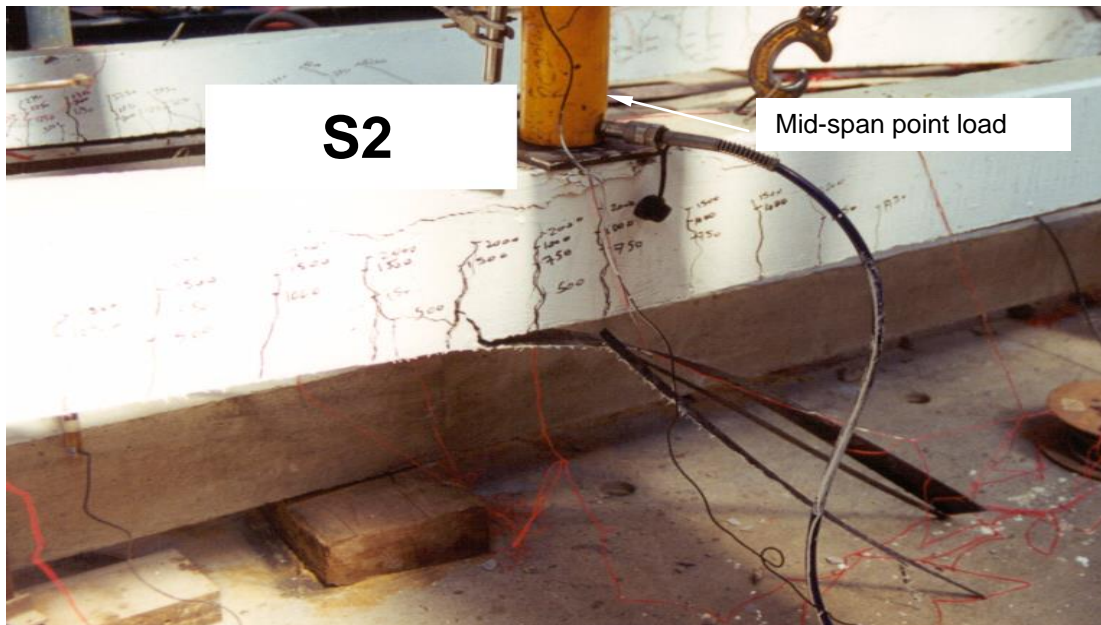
CFRP sheet separation from the beam soffit (beam S2)
